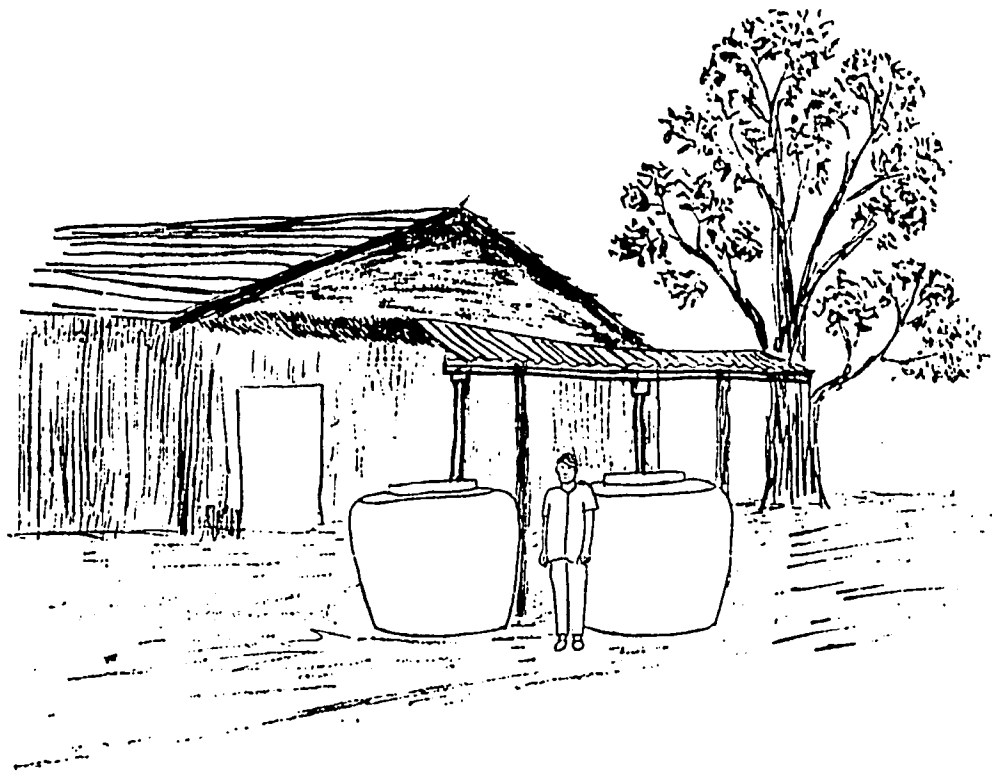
Large jars made of ferrocement are used in Thailand to harvest rainwater from roofs. These roof catchment devices may provide a family with enough drinking water to last through the dry season.
